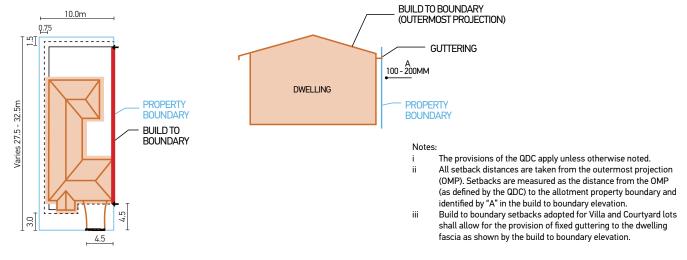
Courtyard Allotment - Typical Building Envelope and Setback Plan
